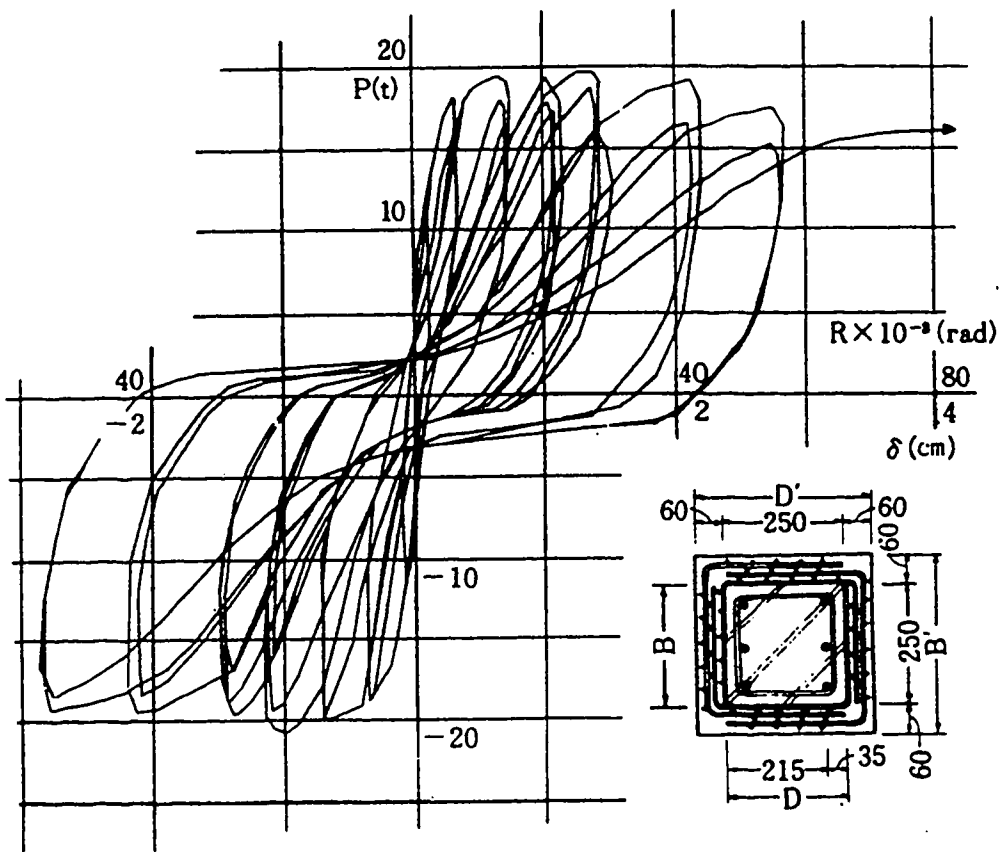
Shear Strengthening of Columns by the Use of Concrete Jackets, Details & Response of the Retrofitted Column, Ref.[26].
